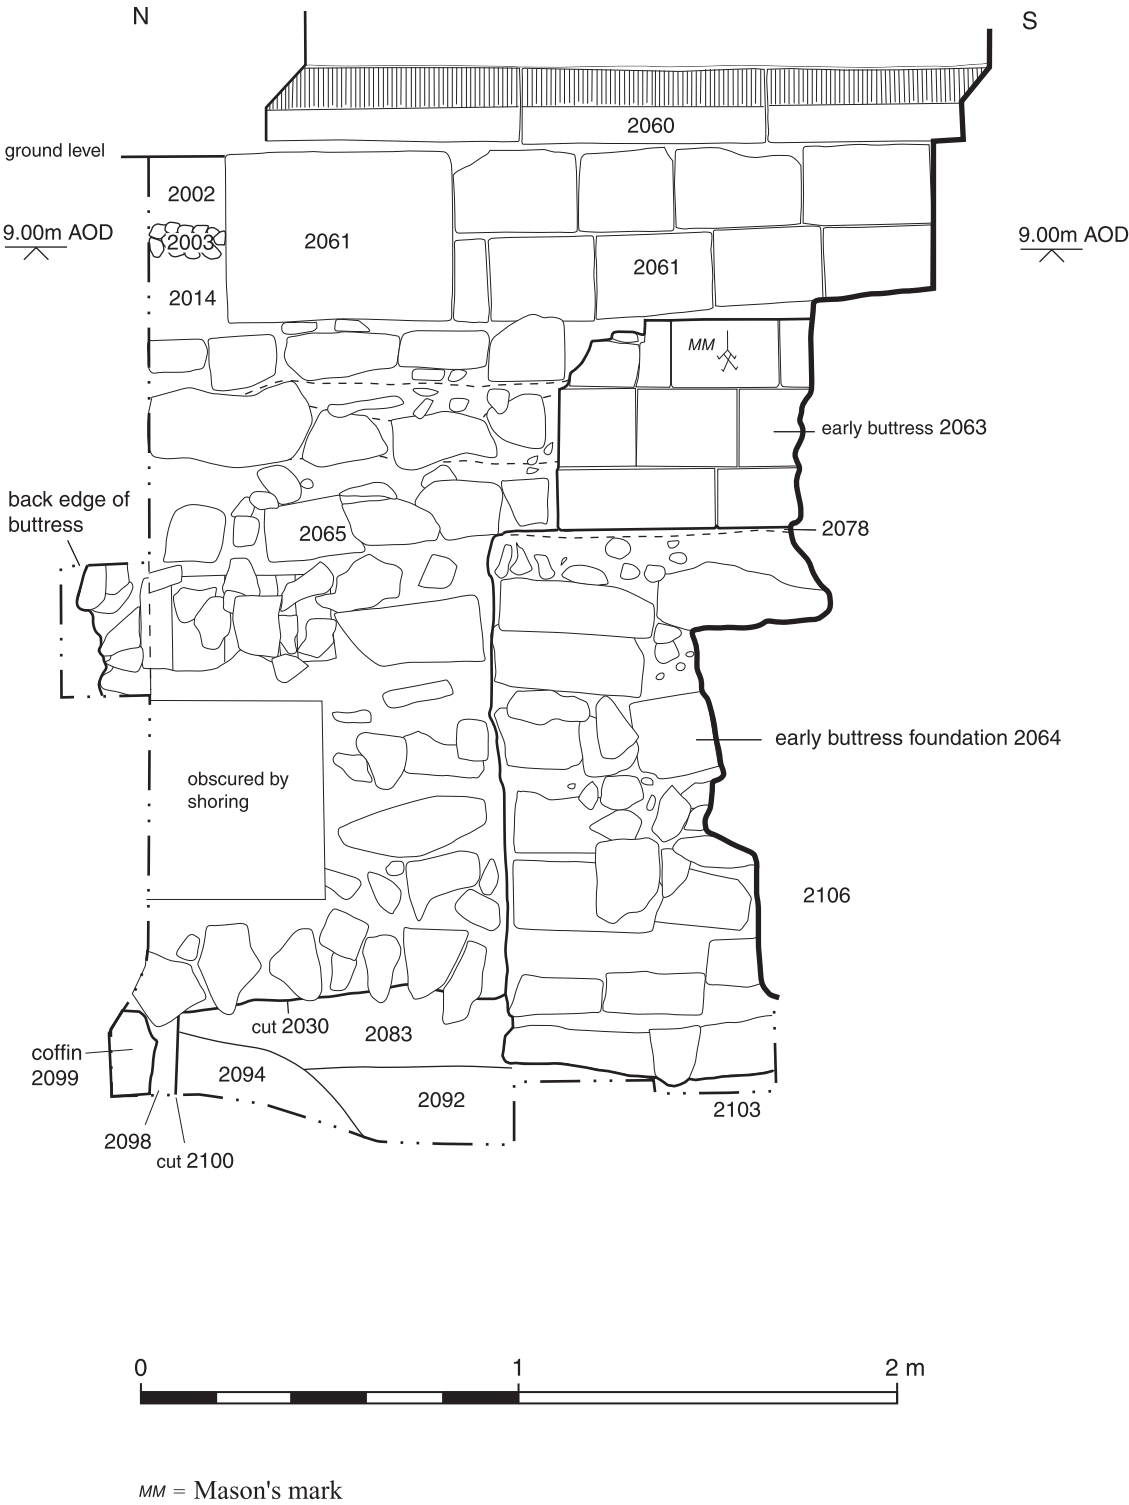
Trench 2, west-facing elevation. Scale 1:20
